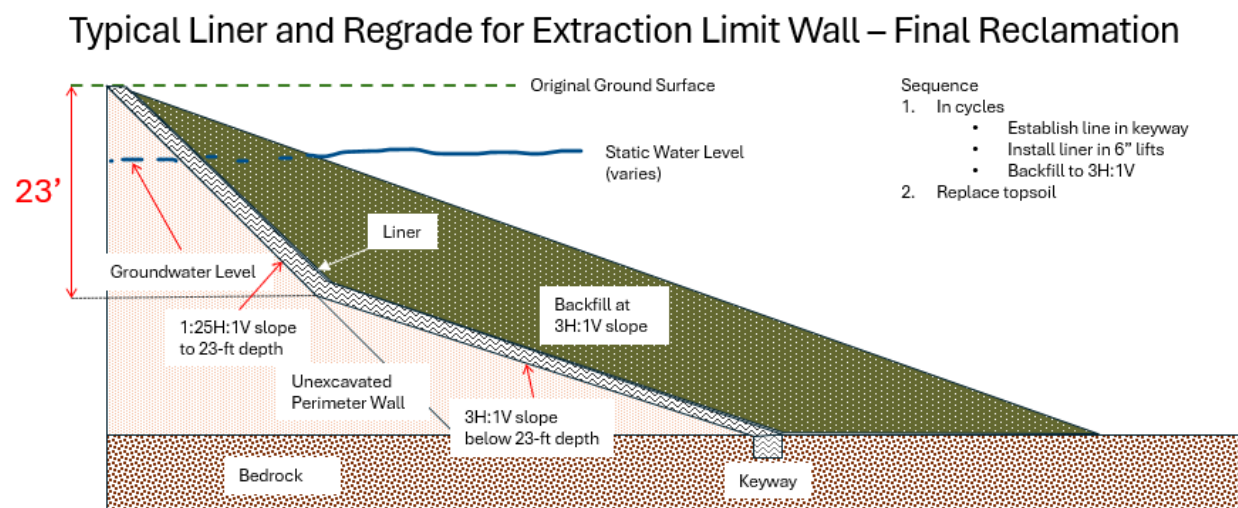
Typical Fully Reclaimed Liner and Backfill Construction
